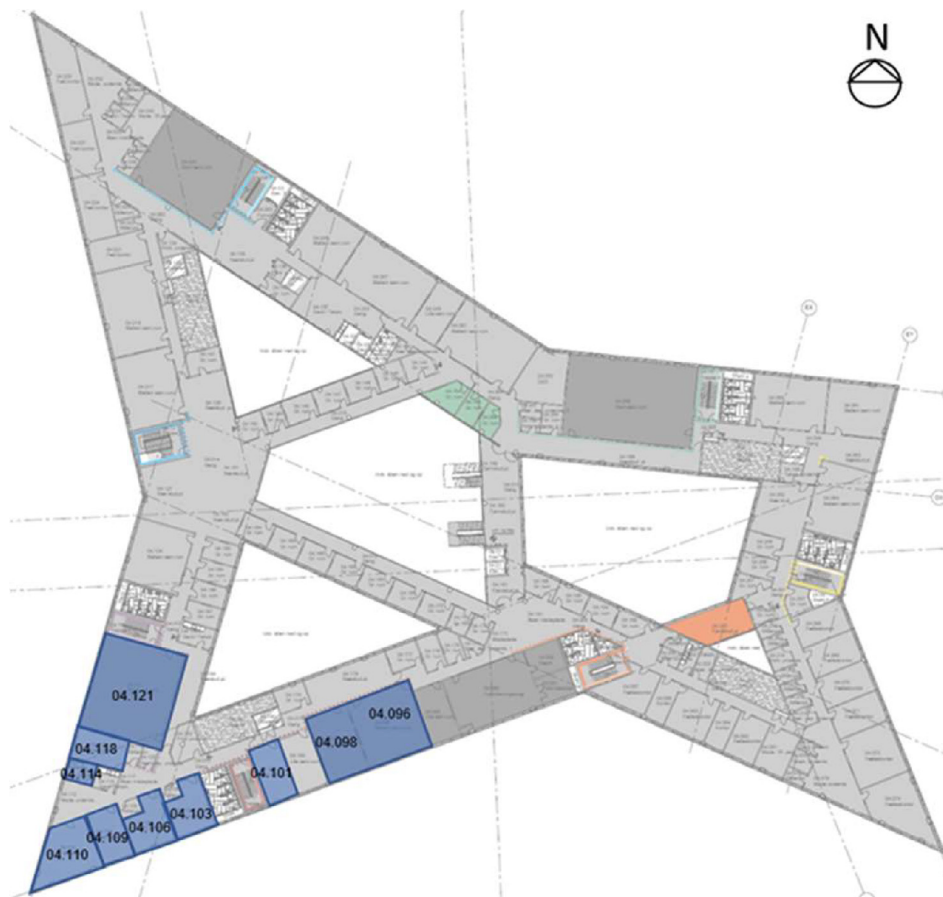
DK Navitas floor plan, showing courtyards and atria.
